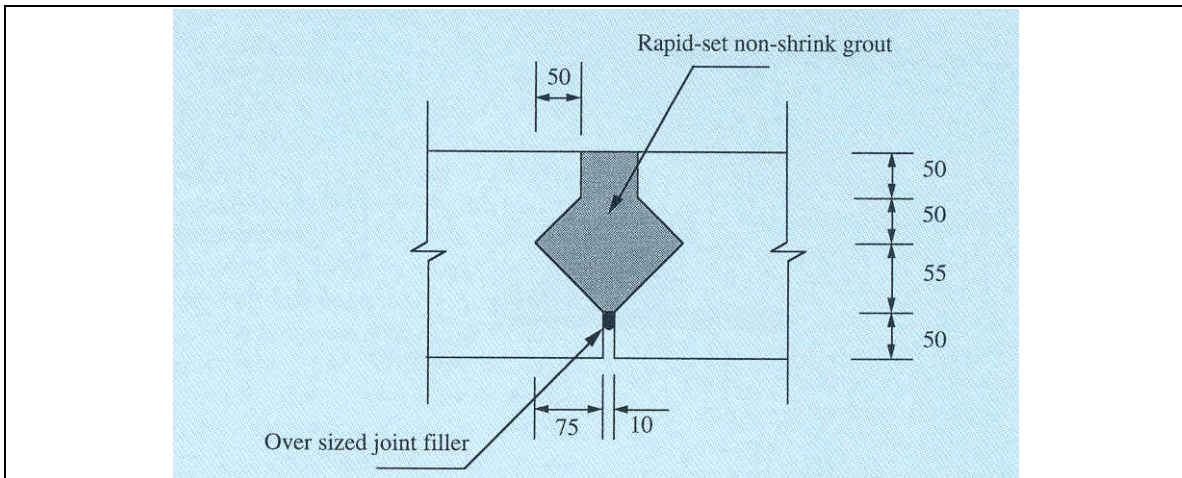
Typical transverse joint shear key section (Yamane et al., 1998)
